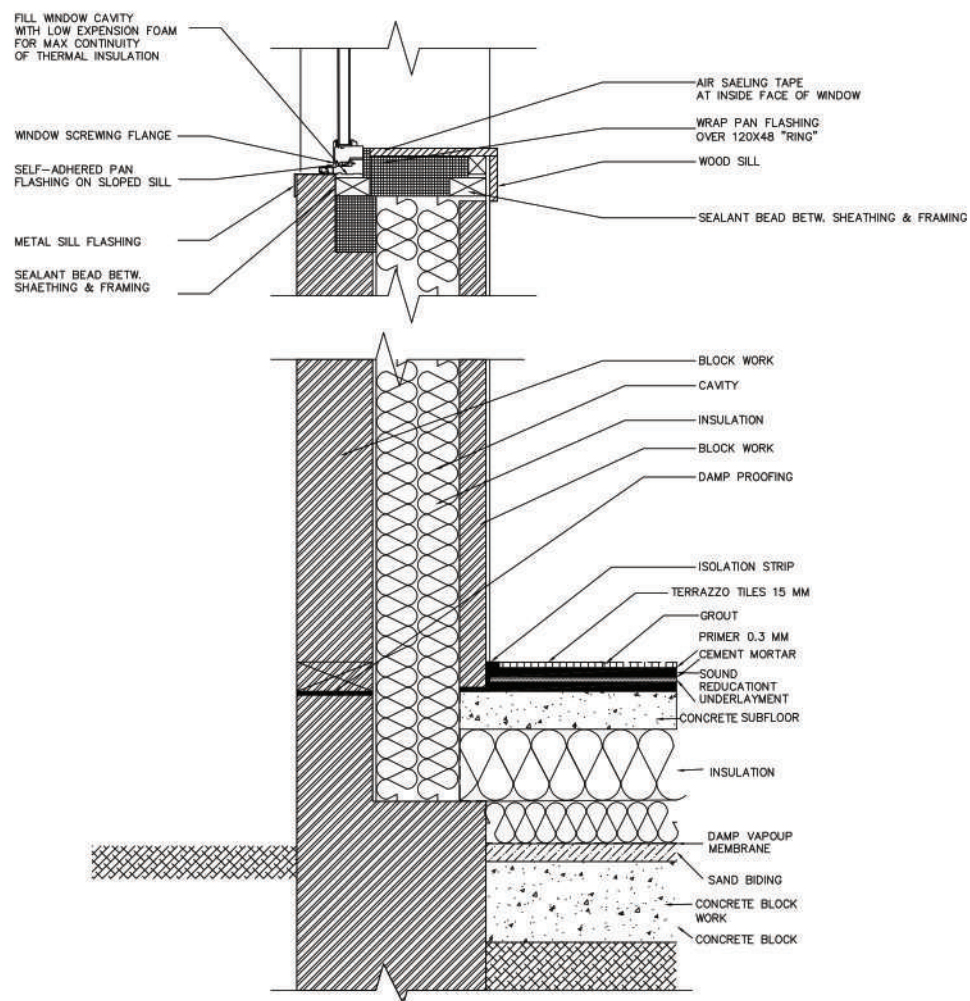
Detail of window installation, outer wall and foundation construction, scale 1-20
